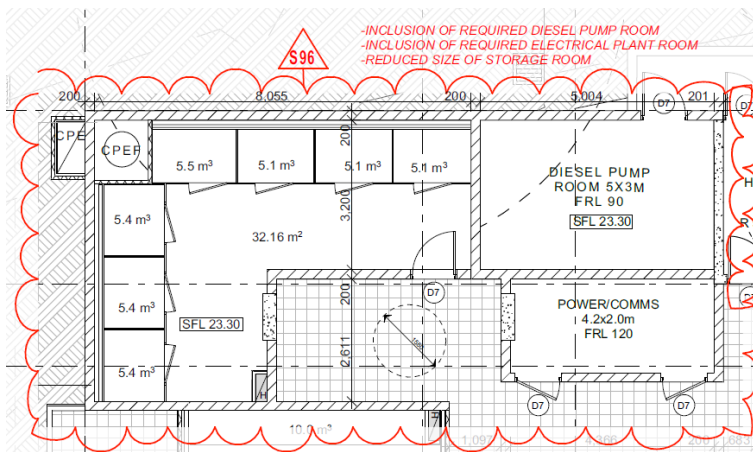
Addition of diesel pump room and MDB on ground floor (Extract from Architectural Plan Ground Floor, A 02.003)
